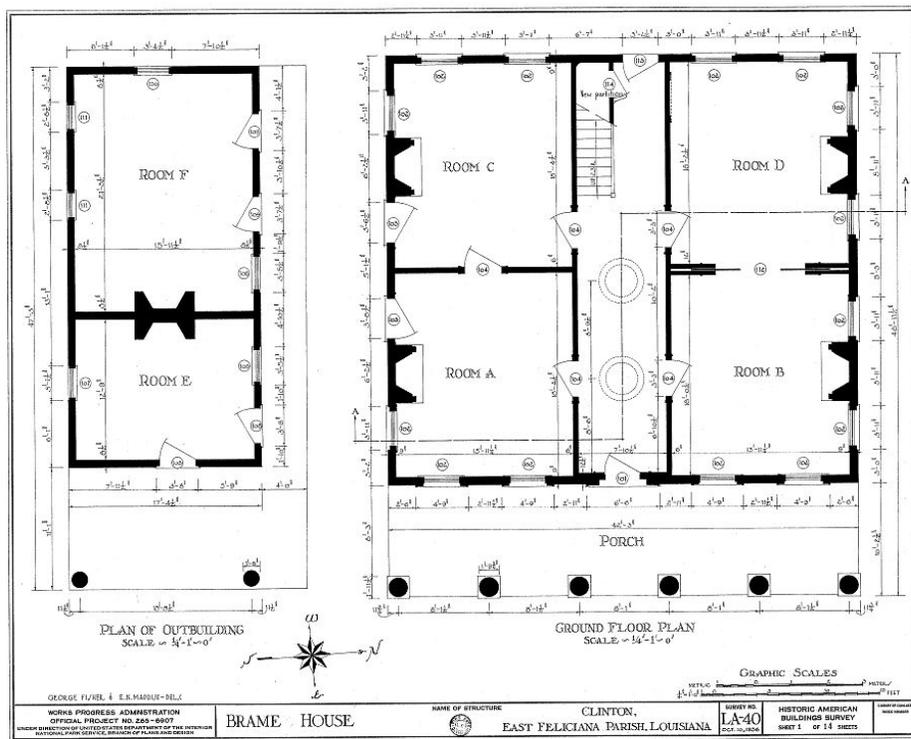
Brame House HABS Floor Plan. October 10, 1936.
